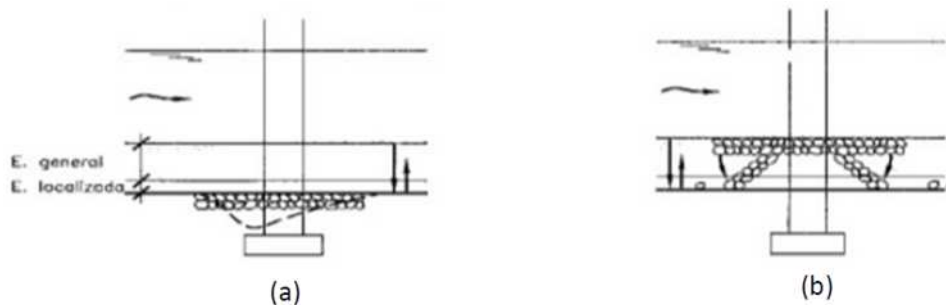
Rock fill protection scheme: (a) Example of rock fill use; (b) Incorrect rock fill location. (Martin Vide, 2003)
